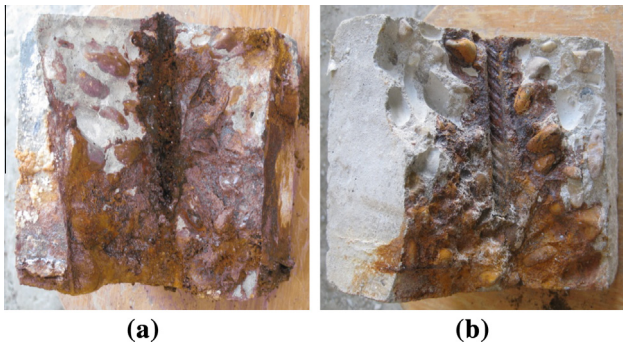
Interface between the corroded steel bars and concrete (a: C0W and b: C30LW).
